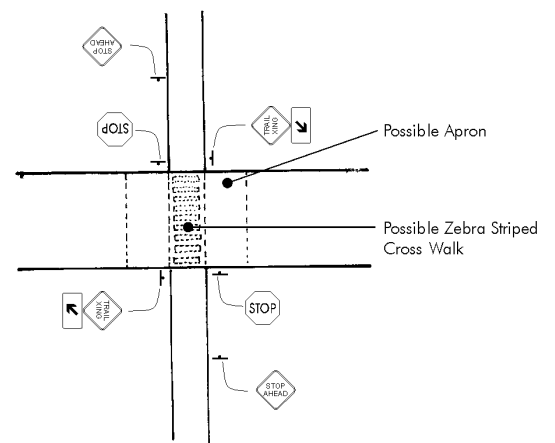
CROSSING LAYOUT FOR RESIDENTIAL STREETS
